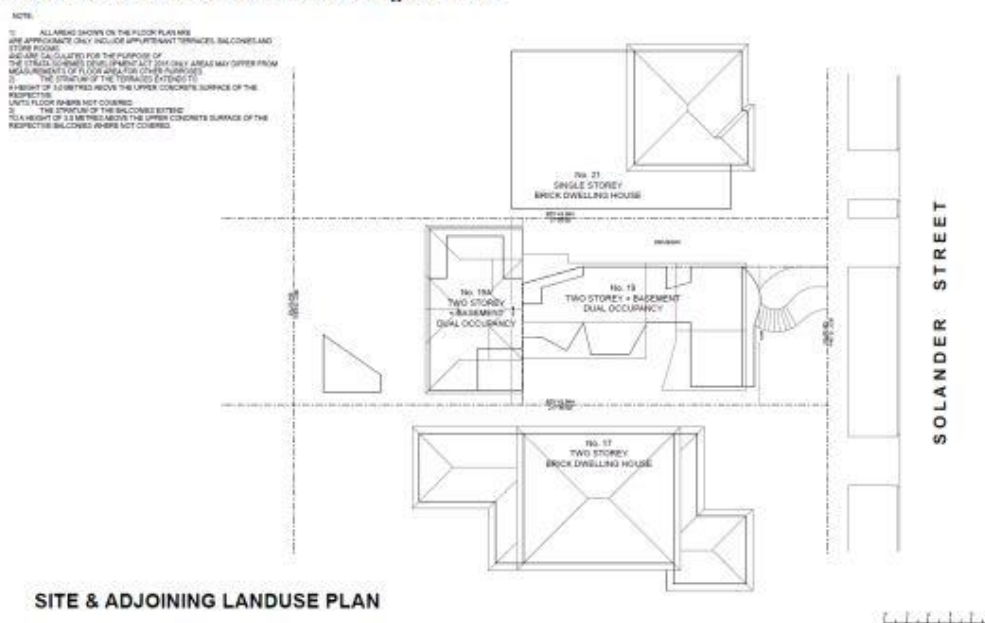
Site plan indicating the existing building footprints (Source: Subdivision Plans)
